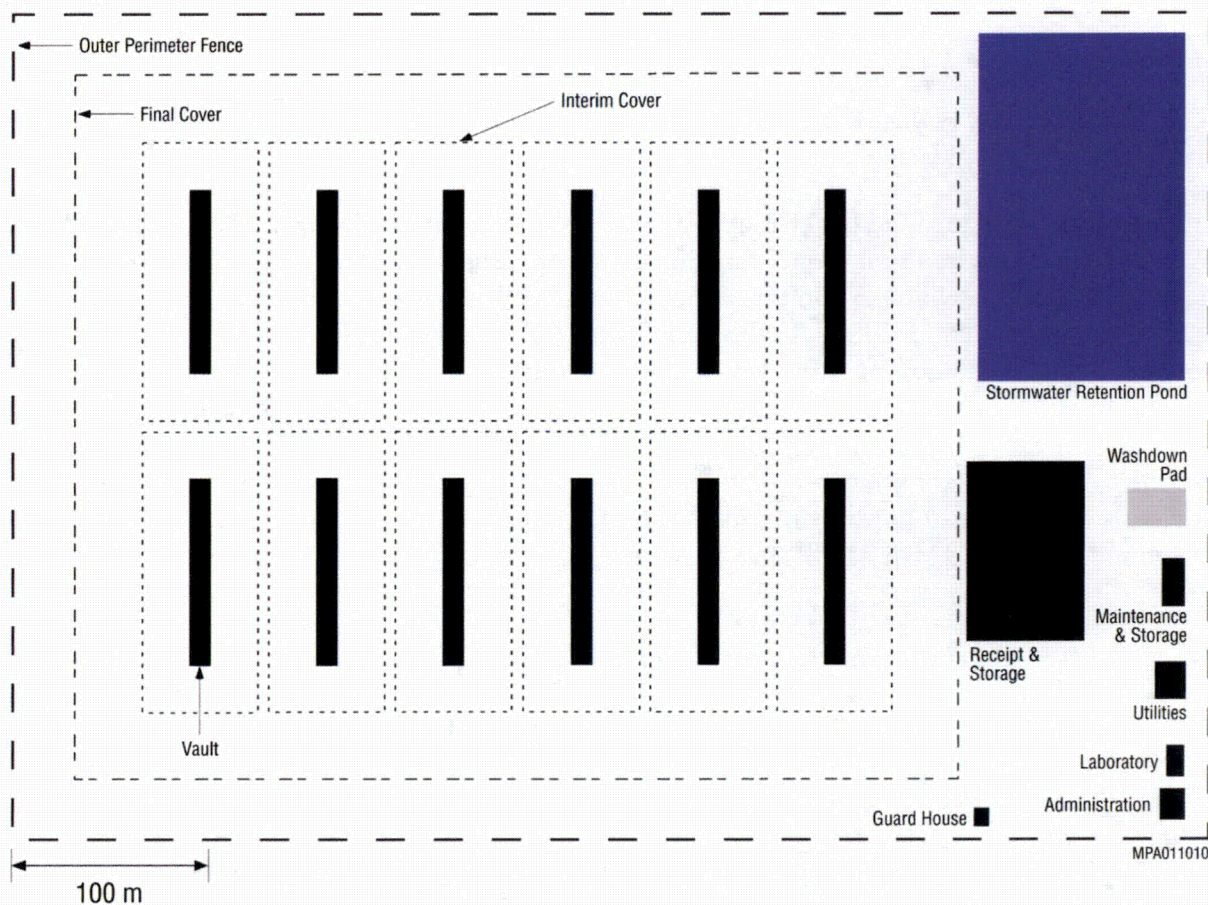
Layout of a Conceptual Vault Disposal Facility
